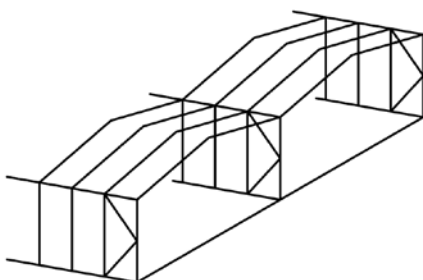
Vertical bracing in the walls and in the planes of the valleys (plan bracing omitted for clarity).
